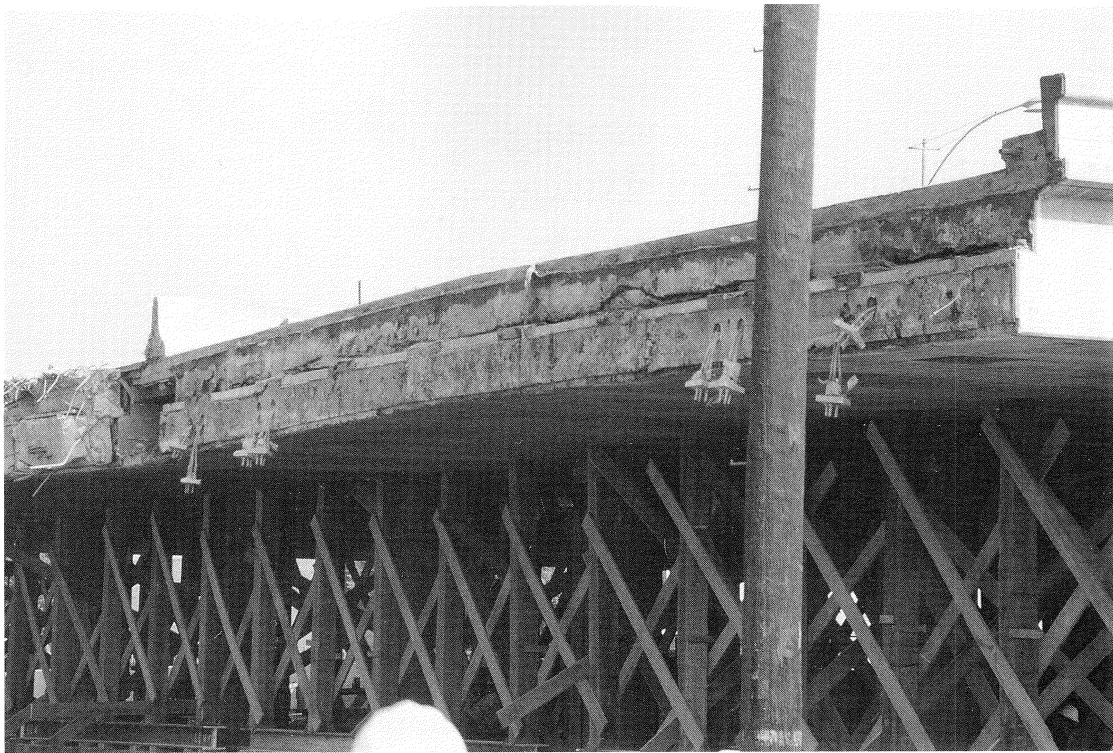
Fairfax-Washington Undercrossing - Side View of Partially Collapsed Eastbound Bridge
